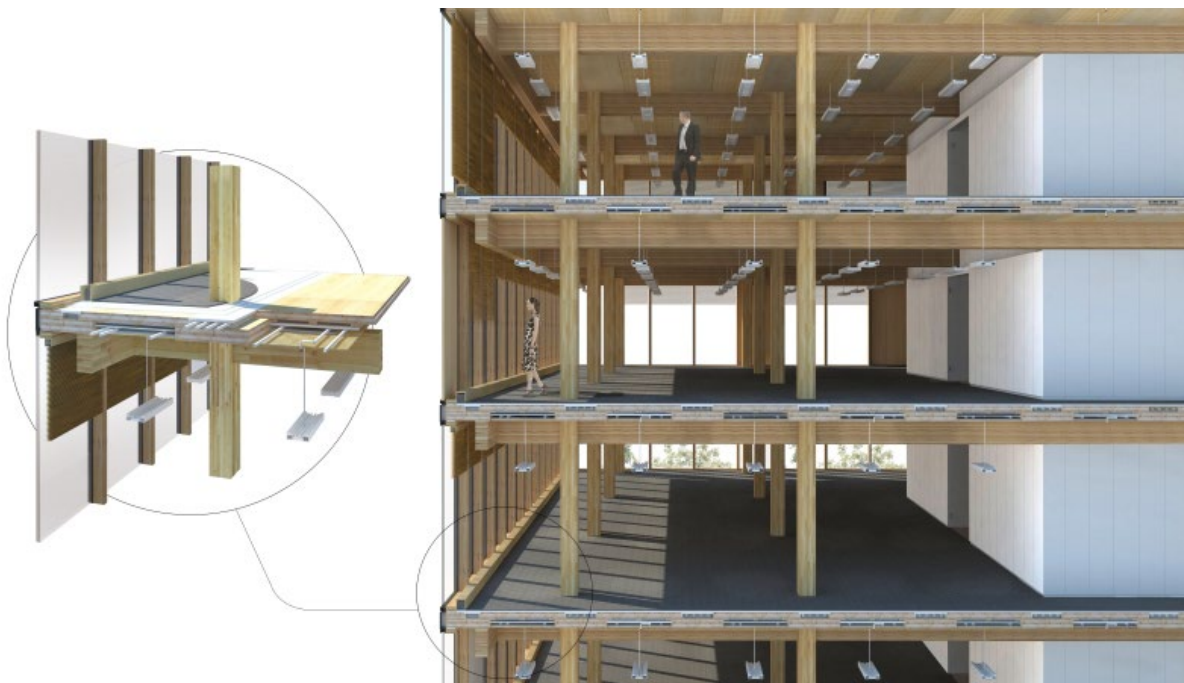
Services integration: Wood Innovation and Design Centre approach (courtesy of MGA | Michael Green Architecture).
